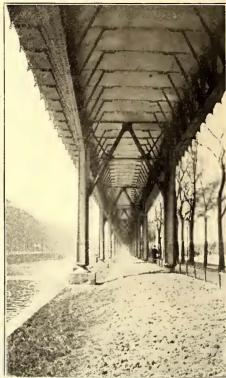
FLOORING ON BRIDGE OVER LANDWEHR CANAL, WESTERN SECTION
